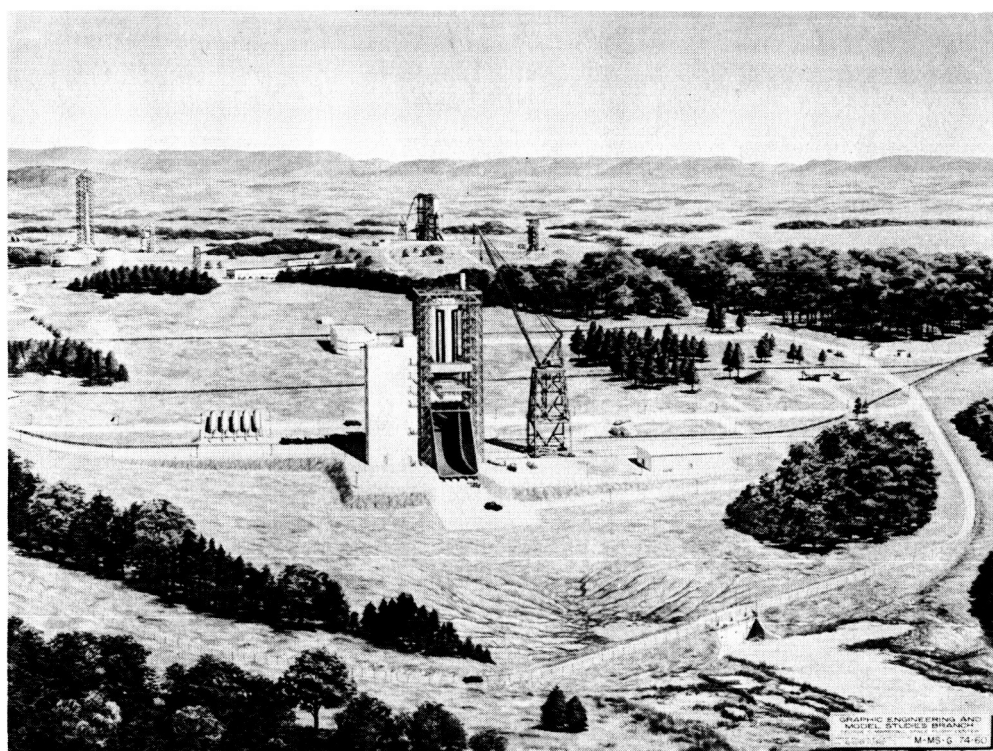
CONCEPT OF NEW STATIC TEST FACILITY, MSFC
